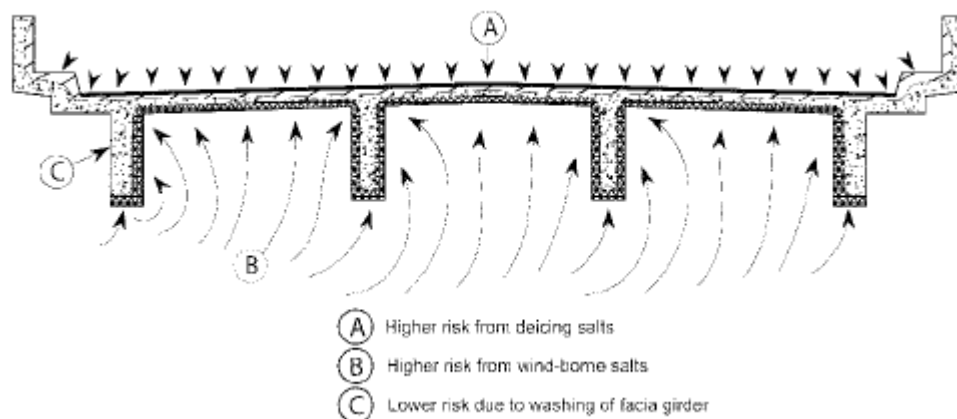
Reinforced concrete bridge cross section showing areas at risk from deposition and retention of chloride ions on structural elements [13]
